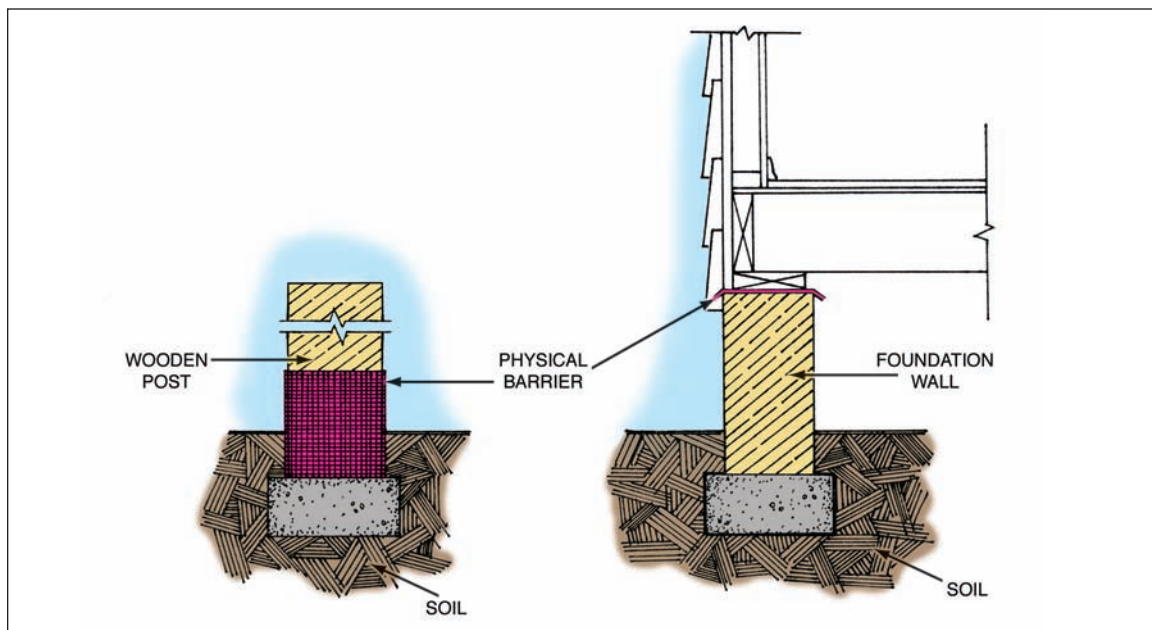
Physical barriers: (above, left) around a post; (above, right) as a wall cap (termite shield).
